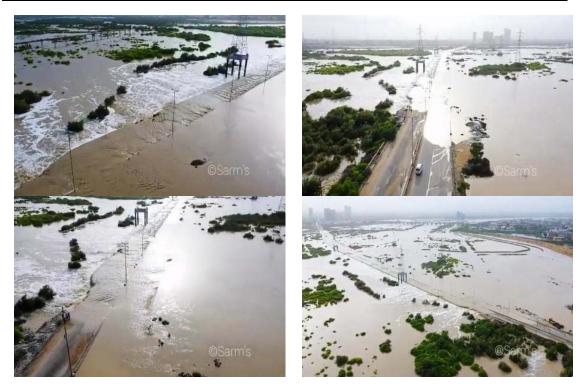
Flood Situation at Korangi Crossing Road (27 July 2022)
